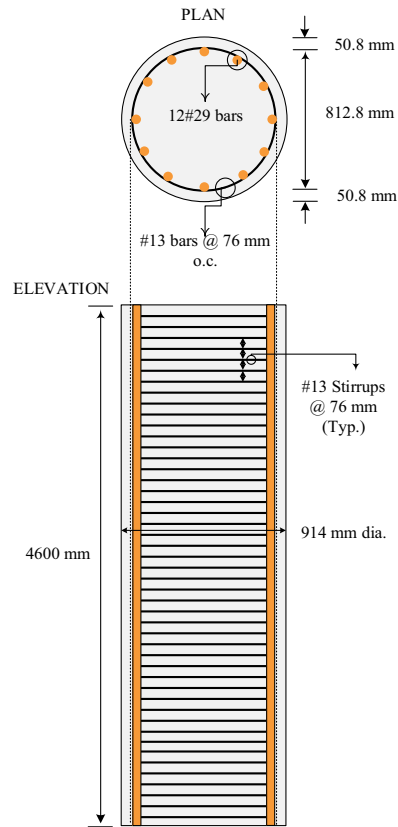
Cross-section and elevation view of the seismically designed reinforced concrete bridge column.
